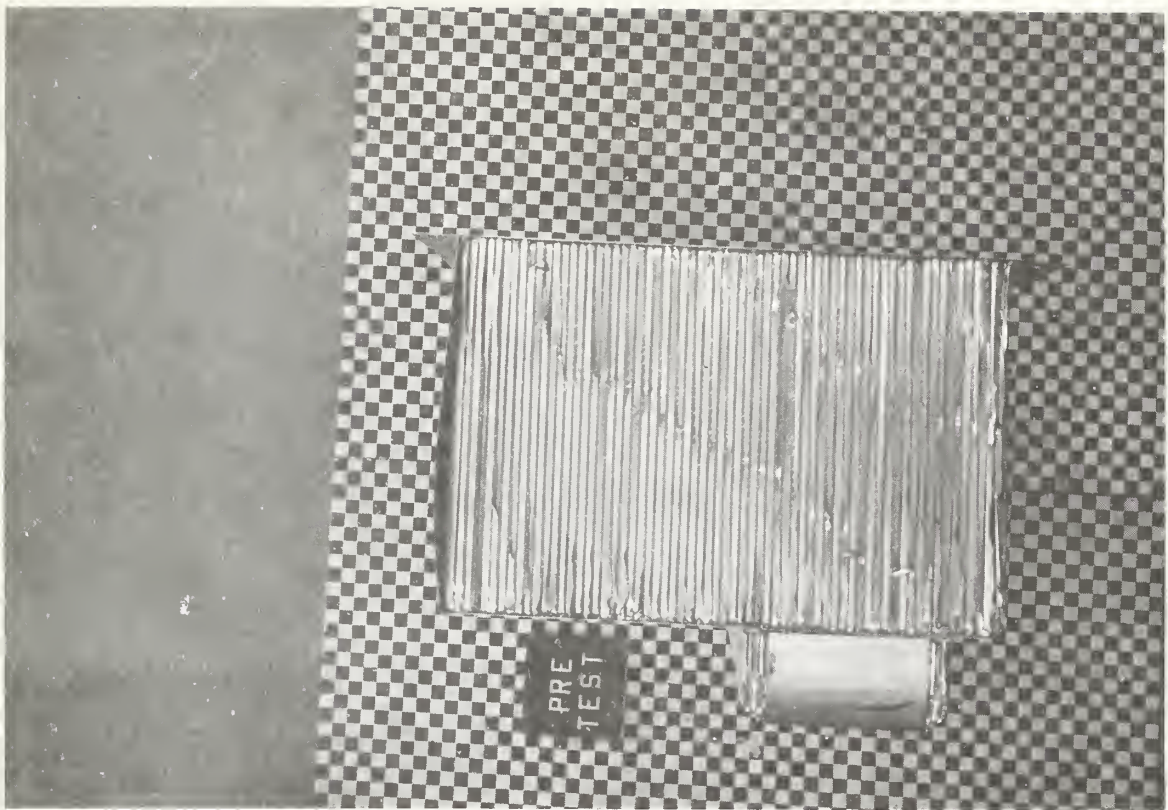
PRE-TEST MDB FACE - VIEW 2
